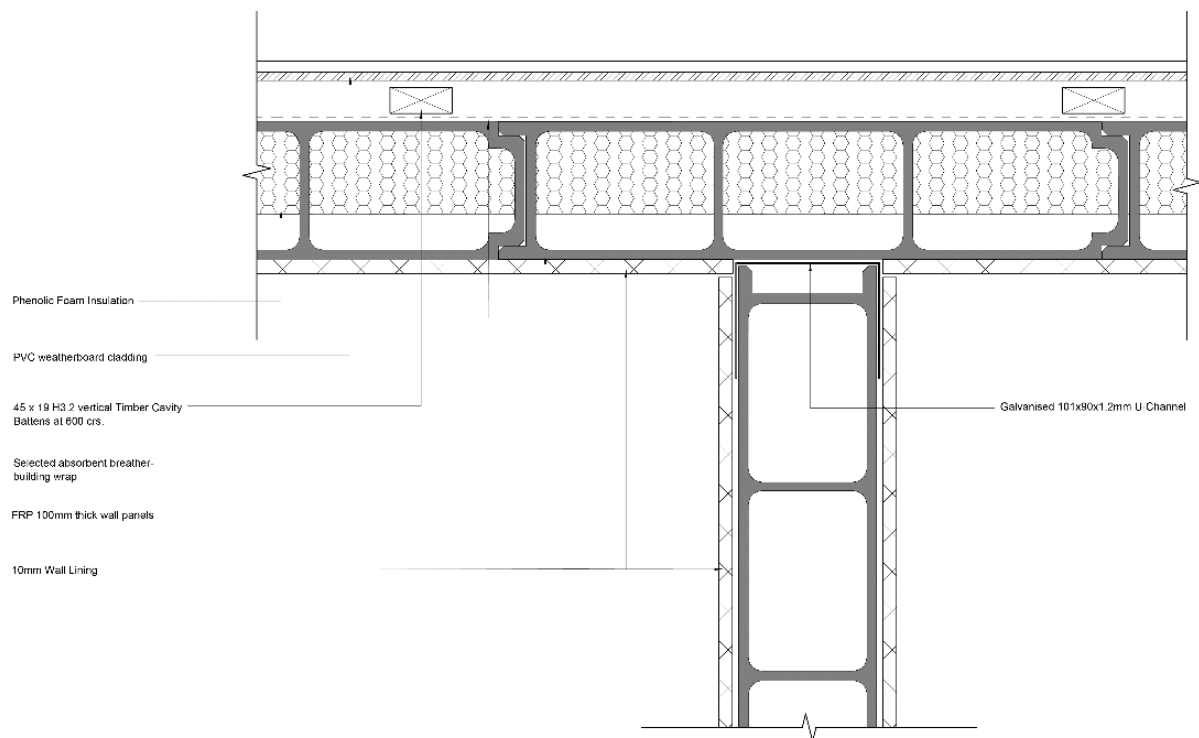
FRP wall panel system-typical joint between internal wall and external wall
